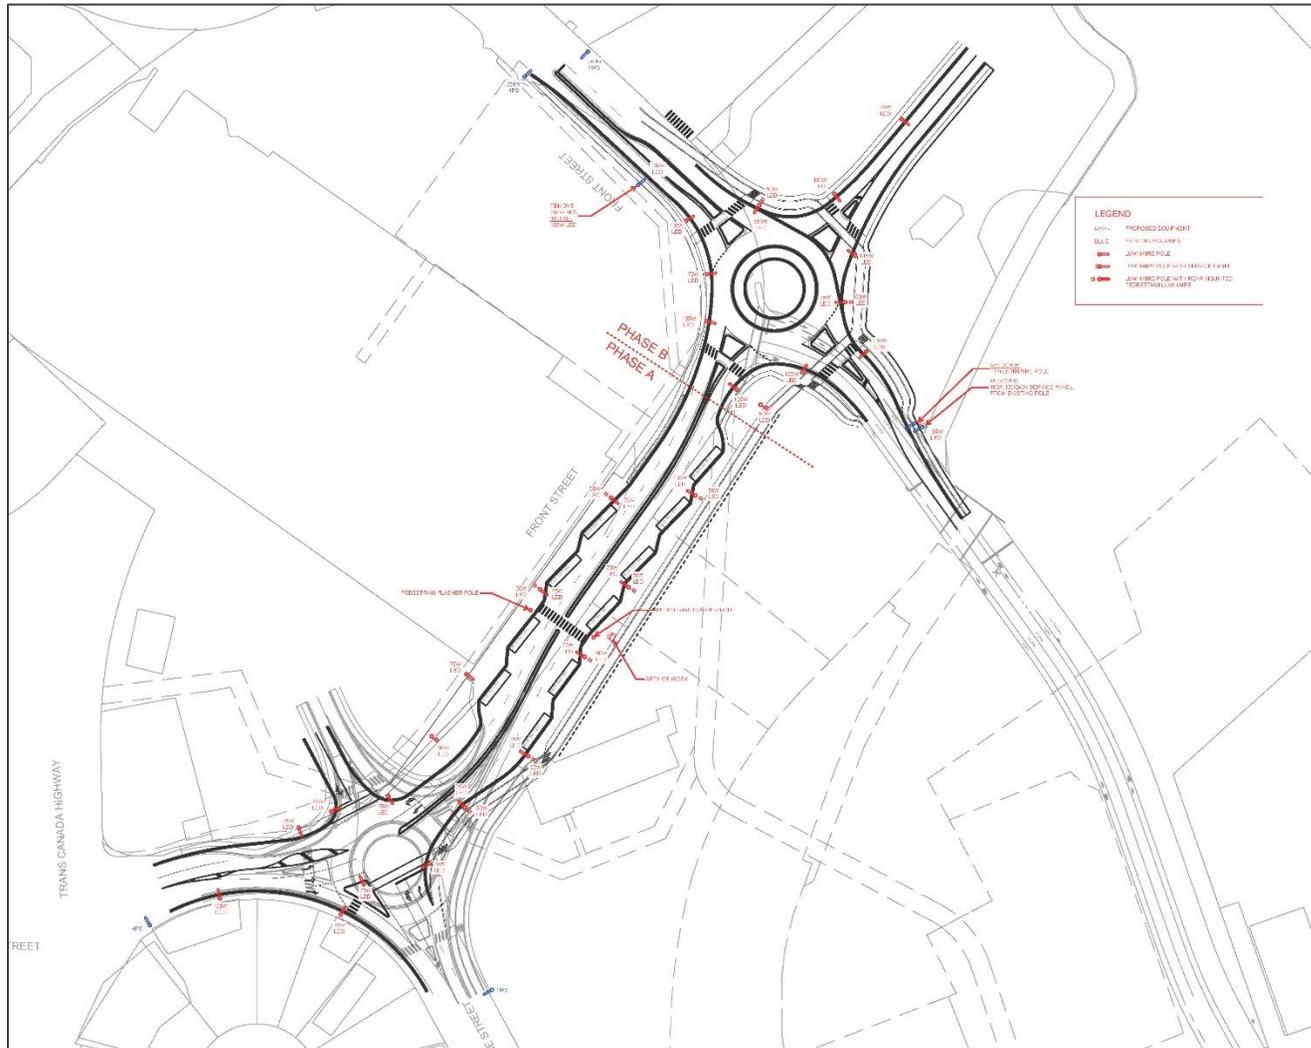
On-Street Exchange with Dual Roundabouts – Stage 1 Electrical Design
